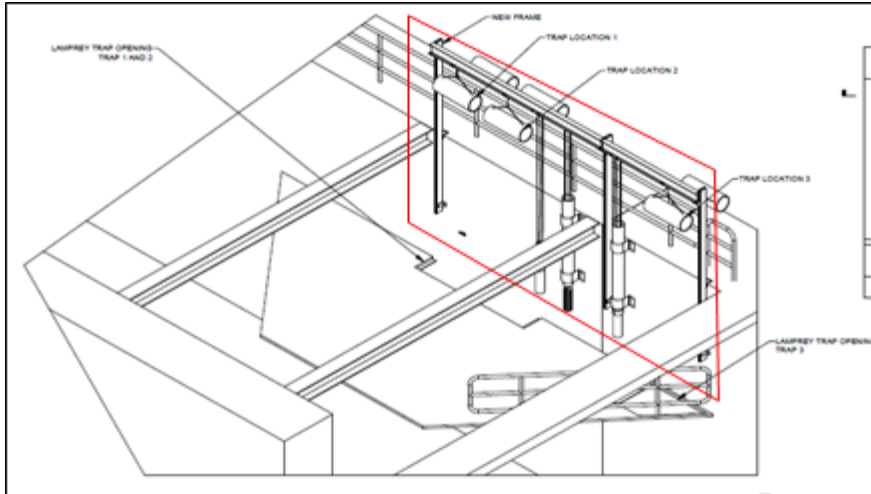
Proposed lamprey trap hoist. The I-beams, counter weight guides, and rope to be installed are framed in the red box and located on the south fishway wall.
